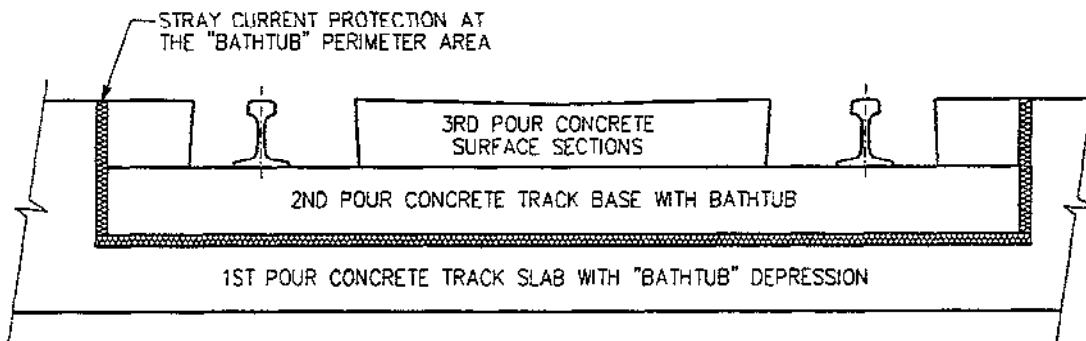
Three-Pour Concrete "Bathtub" Installation
